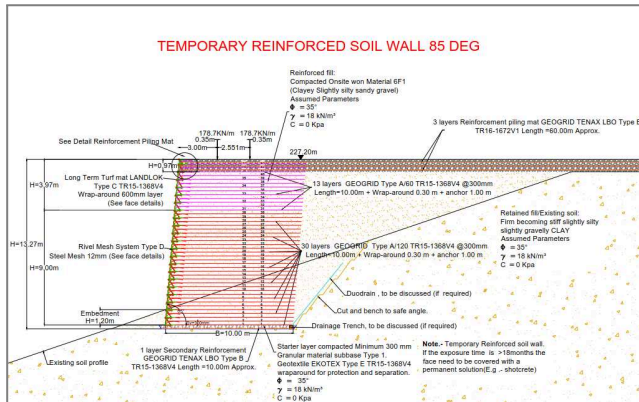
Cross-Section Reinforced Soil Wall Max H = 13.3m
